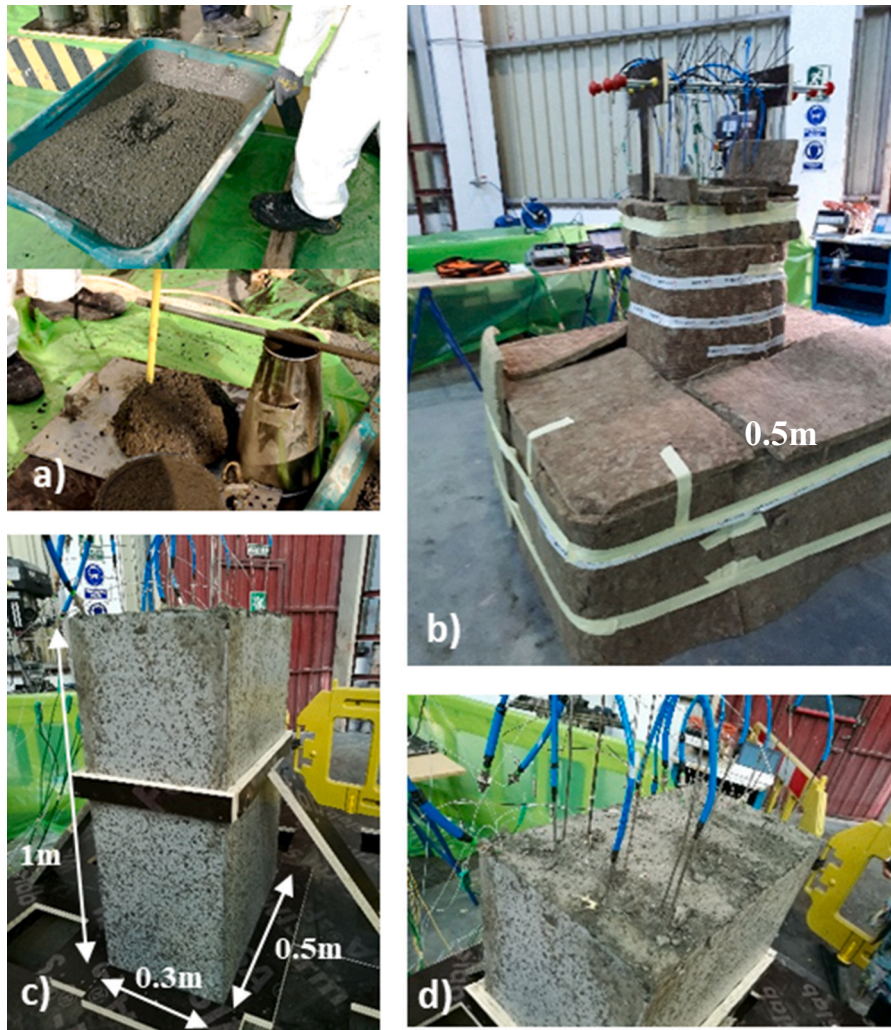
Setting and hardening processes of the concrete layer: a) CAC concrete mix: mix appearance and second slump test, b) CAC concrete layer covered in wood and rockwool panels, c) CAC concrete layer after demolding with dimensions, d) detail of the sensors connectors (FBGs and thermocouples) after demolding.
